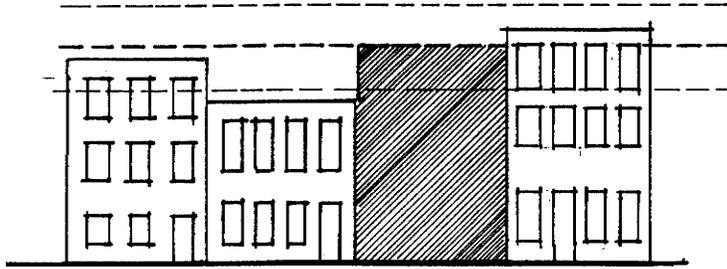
Schematic elevation sketch of a mixed-use streetscape. To create a visually unified streetwall, buildings should be no more than 30% taller or 30% shorter than the average building height on the block.
